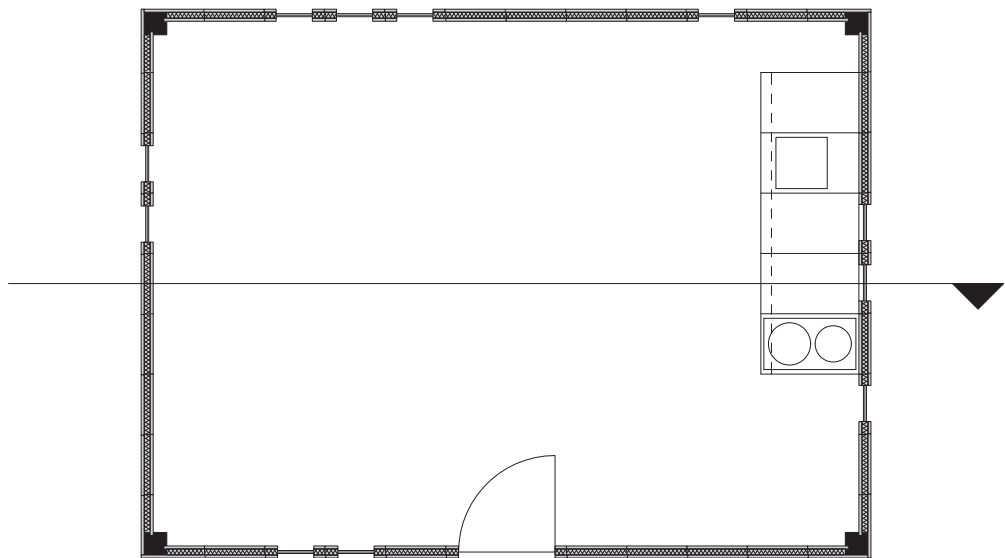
Plan and section at 1:50. Kitchen cabinetry are built into structural cladding panels, and can replace the cladding panels within the transitional house. They can be rearranged in various configurations, at any point within the house. Additional kitchen panels can also be brought in at a later date if desired.
